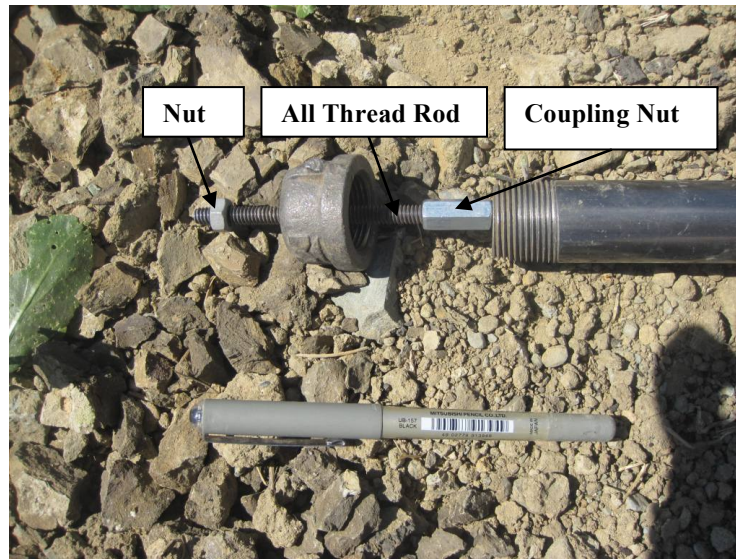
All thread rod fixed in-place by a nut and a coupling nut
